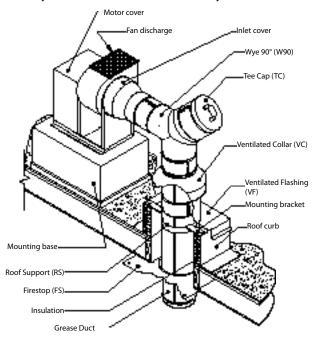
Utility Fan Exhaust Finished Assembly
